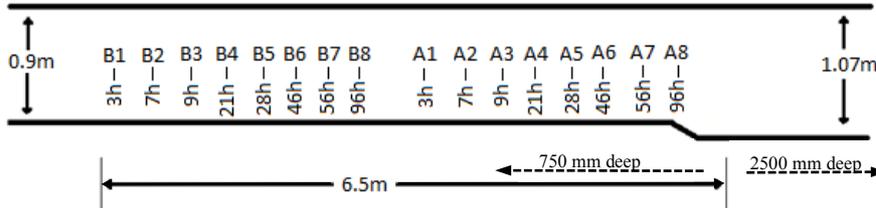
Measurement pattern on a trench of a construction site (Site 2, mix A)
